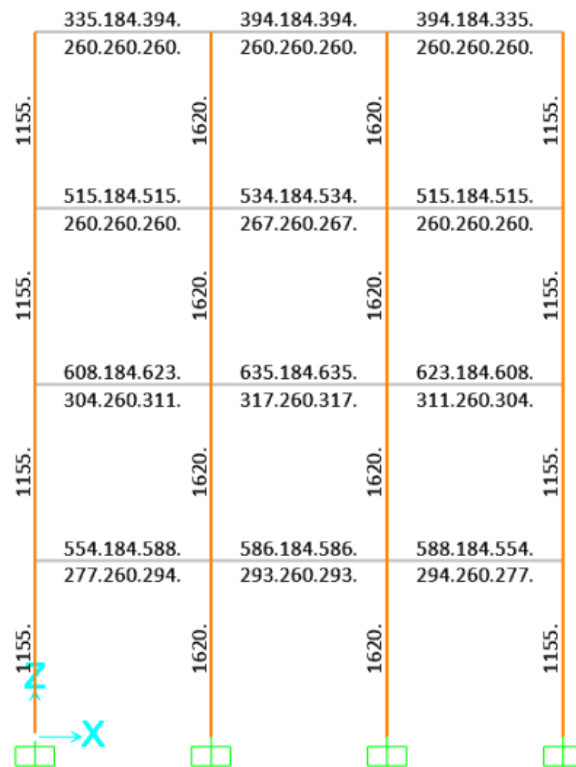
Reinforcement details in RC frame of SAP 2000 model
